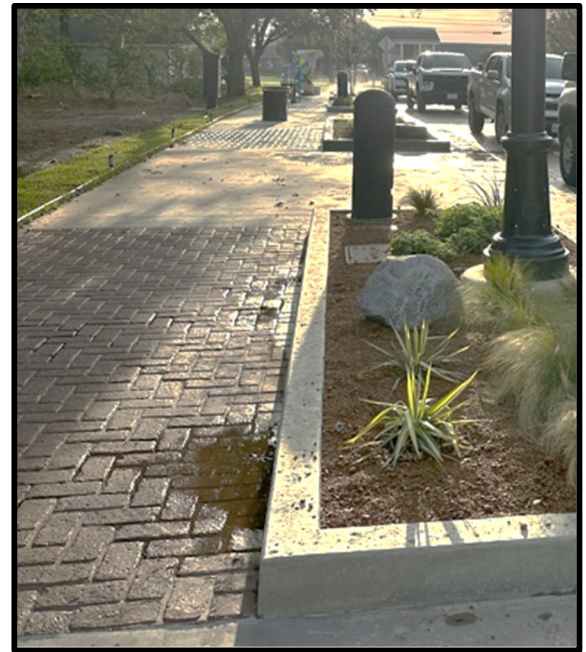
Stamped and Stained Concrete May Be Used Instead of Brick Pavers If Preferred.
